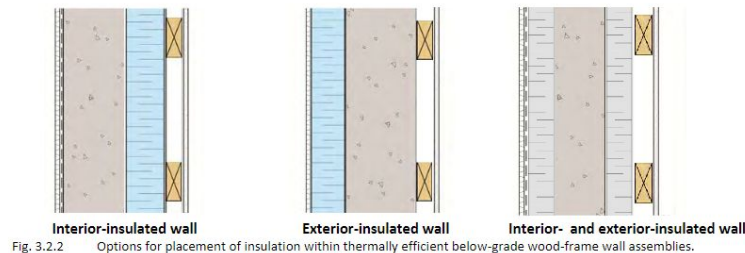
Options for placement of insulation within thermally efficient below-grade wood-frame wall assemblies.
